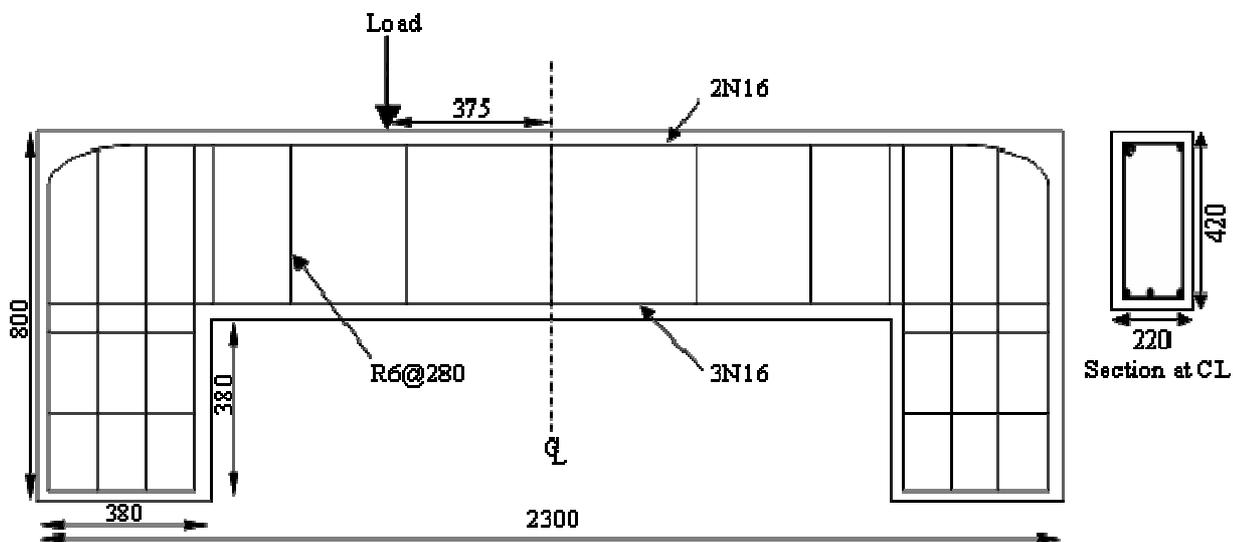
Typical layout of scaled model of Tenthill Creek Bridge headstock
